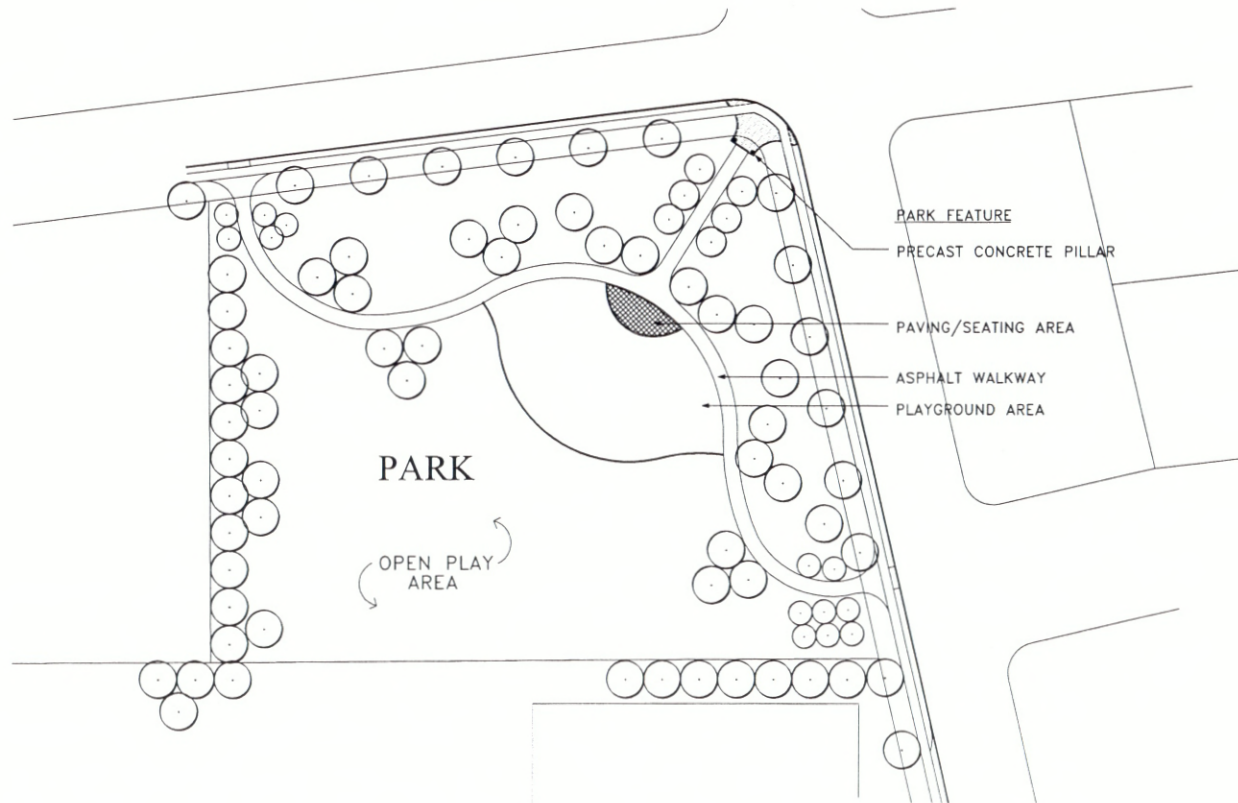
TYPICAL NEIGHBOURHOOD PARK CONCEPT PLAN N.T.S.
